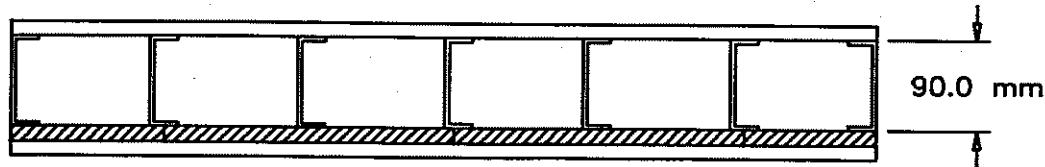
Screw Locations For Steel Stud, 1x2 Gypsum Board Layers, Full-Scale Assembly, Fire Exposed Face
